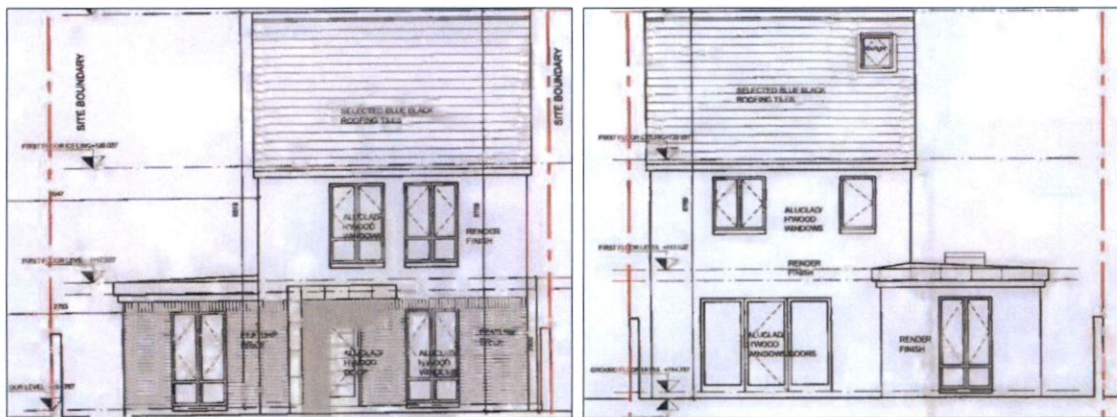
Elevations refused under Reg. Ref. SD19A/0128 and ABP Ref.307316-20. Front elevation (left) and rear elevation (right).
